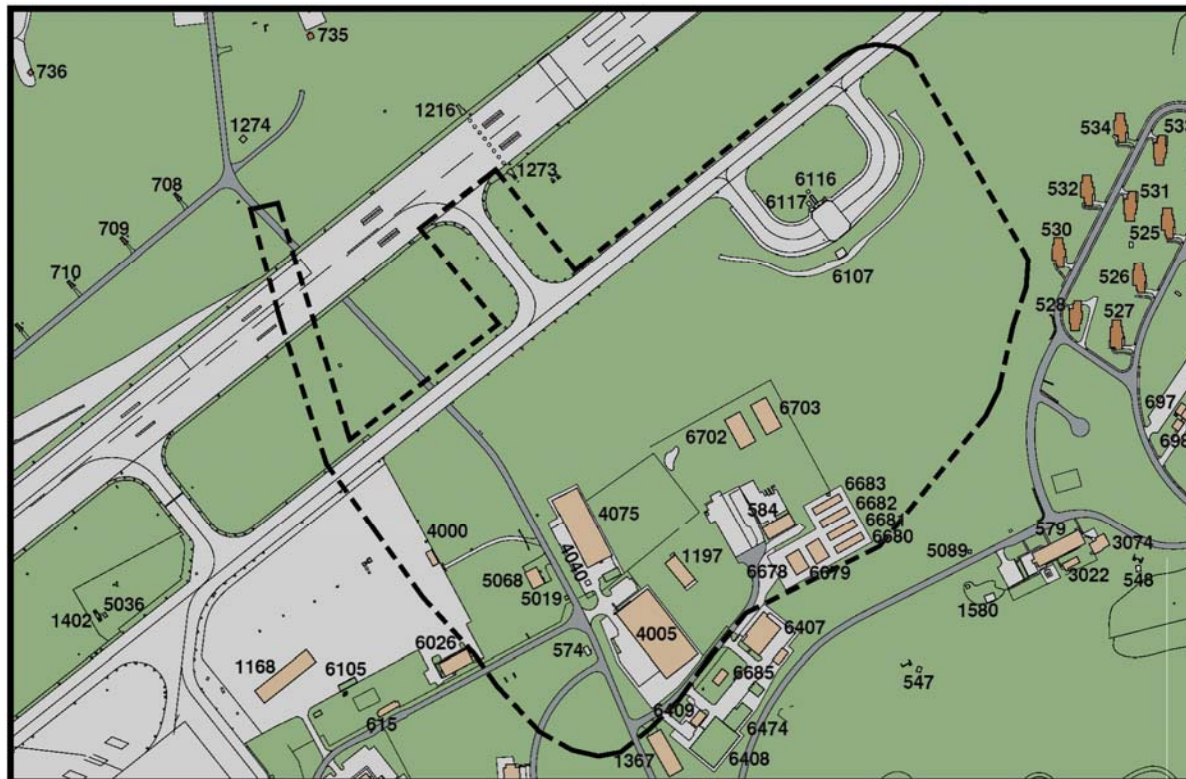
Partial site plan of MCB Hawaii Kaneohe Bay illustrating site C. The facilities within the dashed boundary are proposed for demolition. A MV-22 Aircraft Maintenance Hanger, an aircraft parking apron, a MCAS OPS complex, a new sewer pump station, wash rack, and a POV parking lot. Also, the road will be realigned and a new sentry station will be added.
